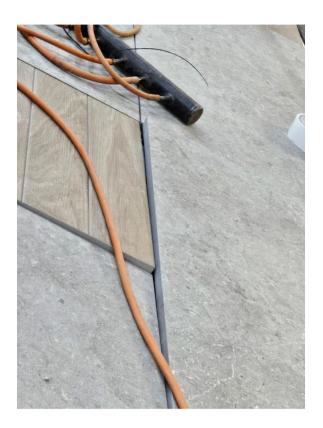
Tiles Not Under Test Have Failed Due to the Rails Lifting
